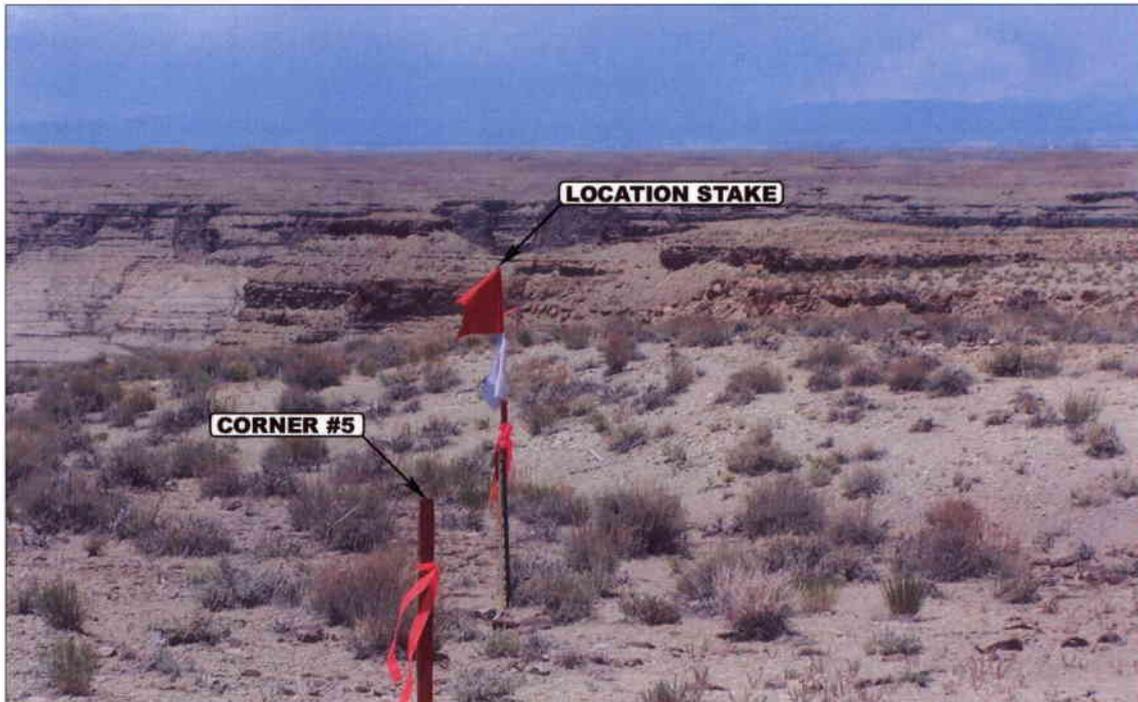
PHOTO: VIEW FROM CORNER #5 TO LOCATION STAKE
